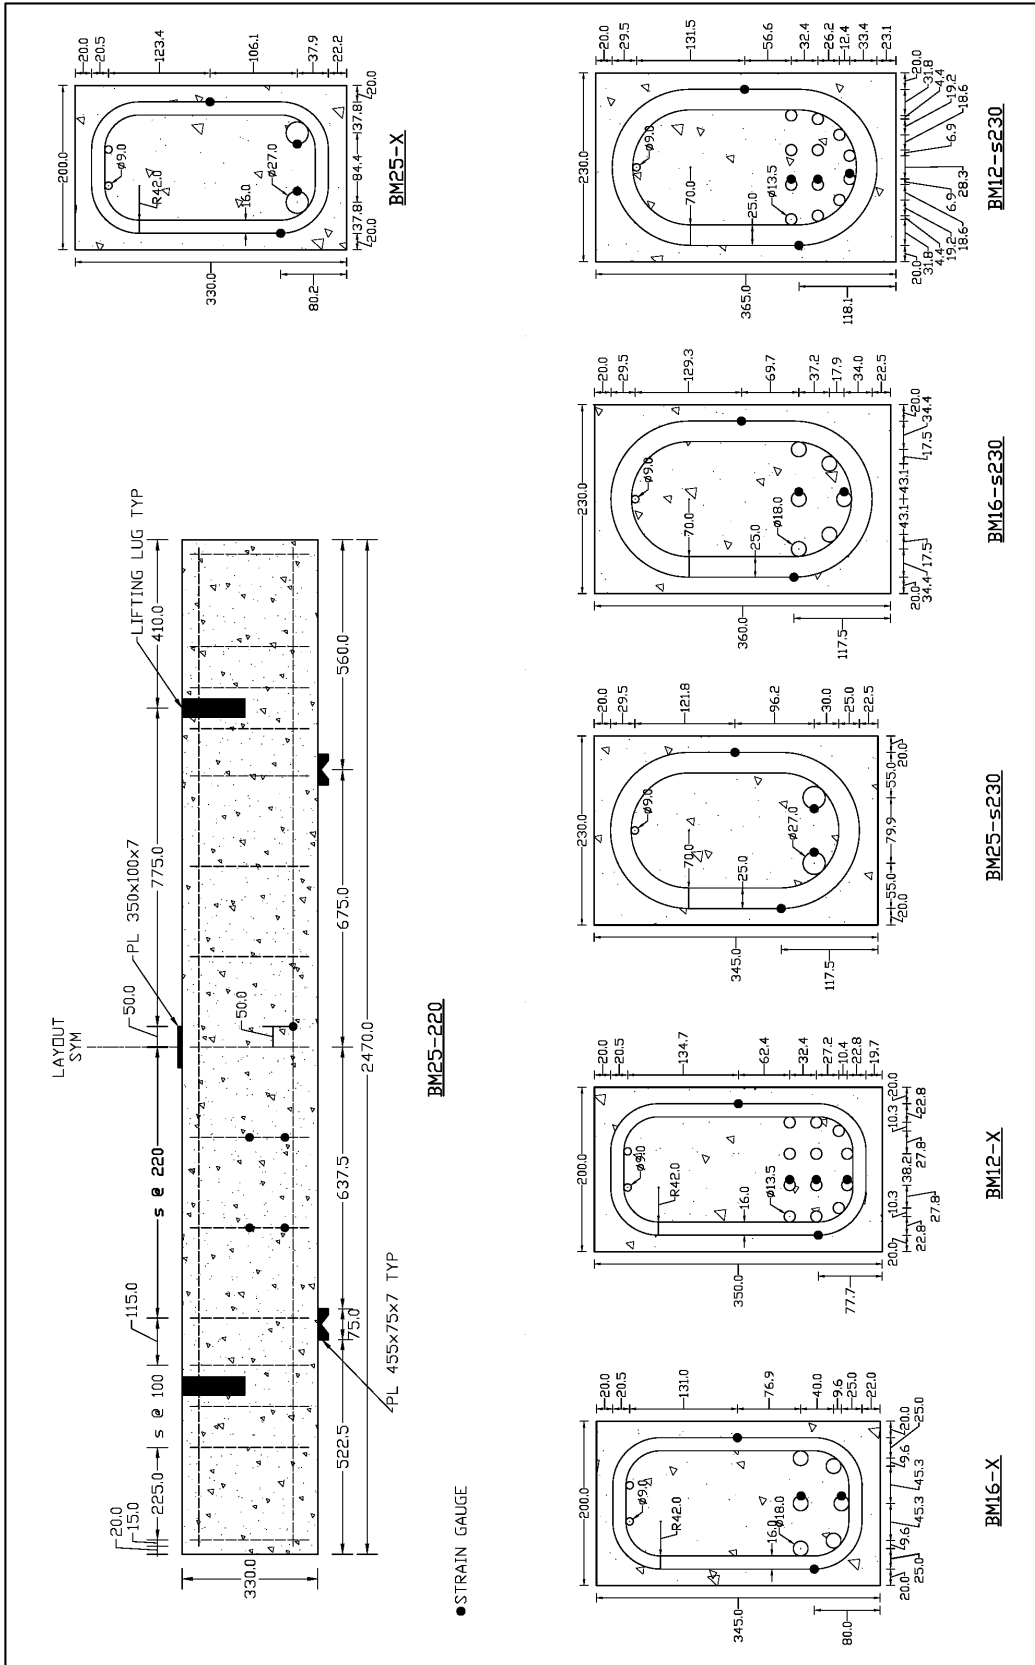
Elevation for Beam BM25-220 and Schematic Cross-Sections for All Beams
